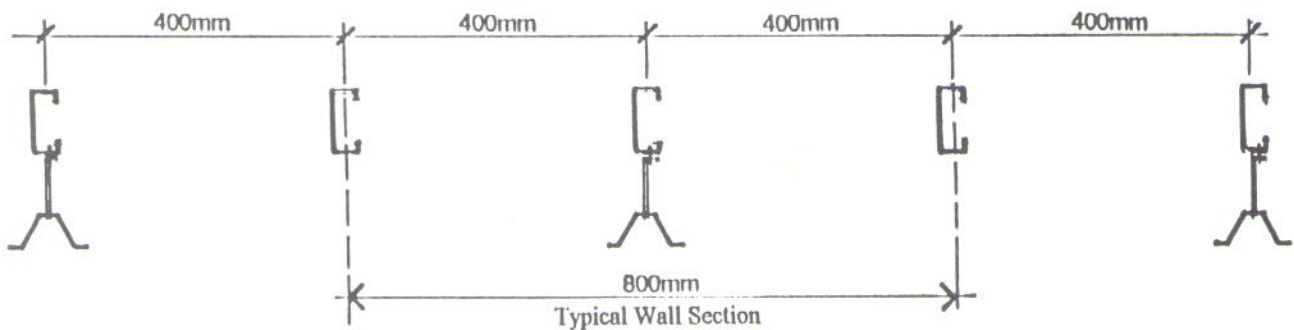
Horizontal Spacing of Shear Connectors Attached to the Webs of the Steel Studs
